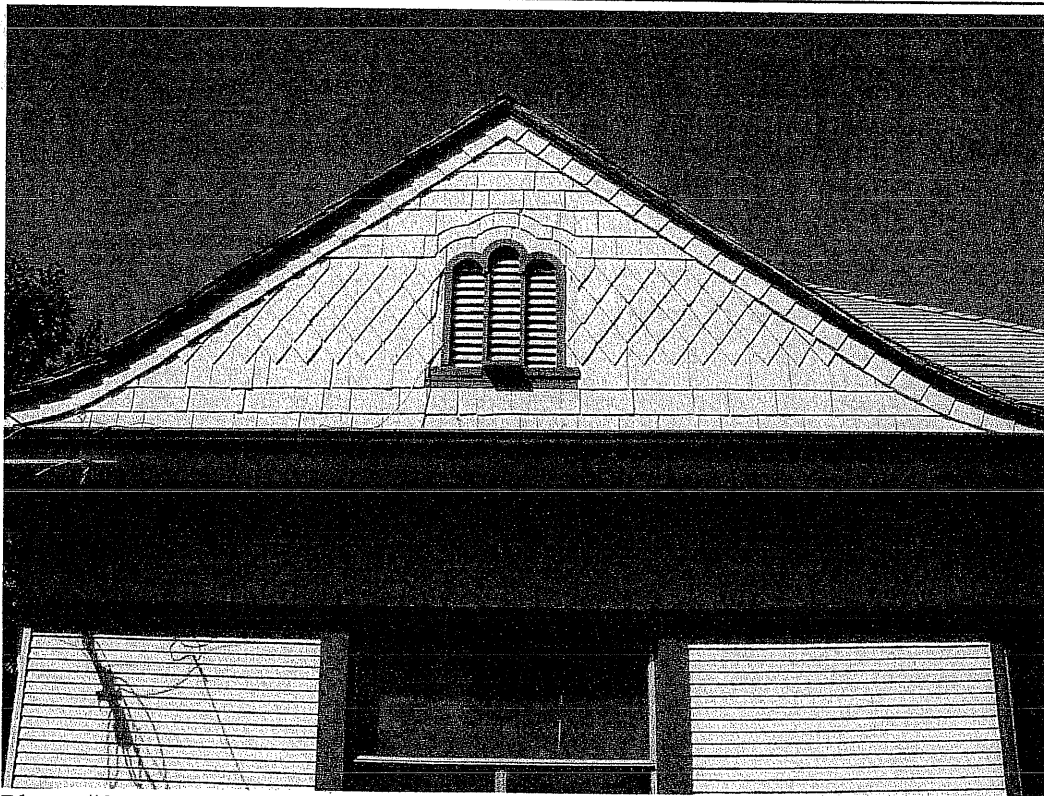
Detailing of wood shingle work beneath front gable, note vent.
